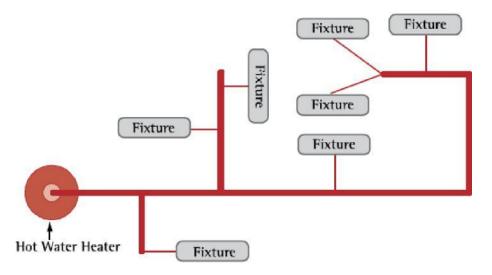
A General Configuration Typical of Trunk and Branch Systems
